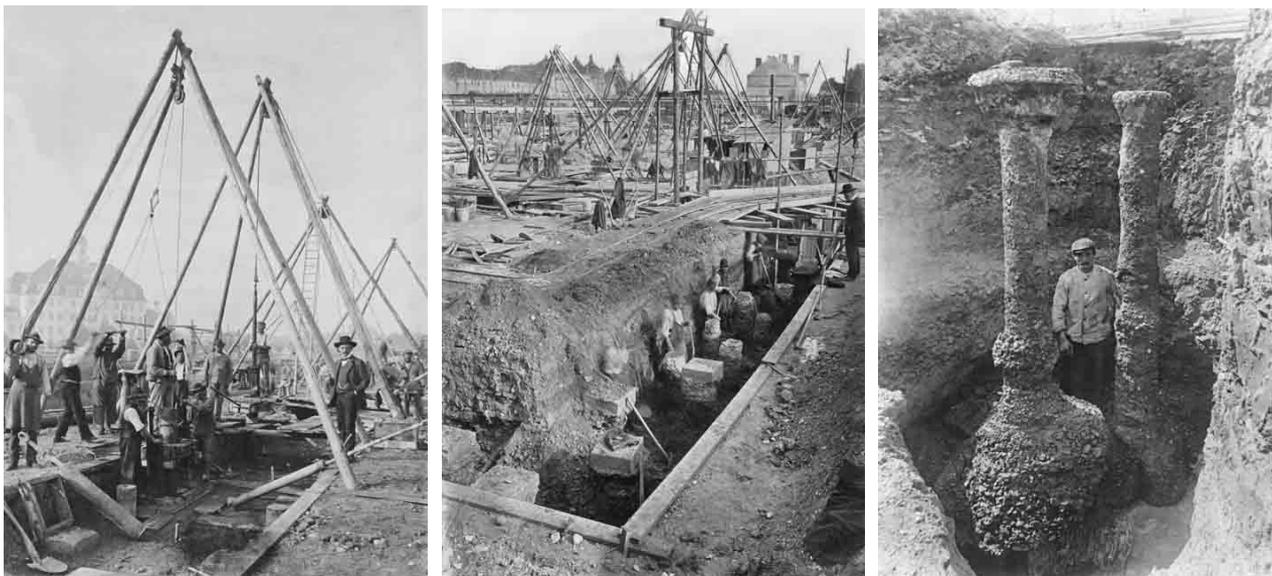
(left): Manual drilling for Strauss piles 1909; (ABDM-BN_36969)
